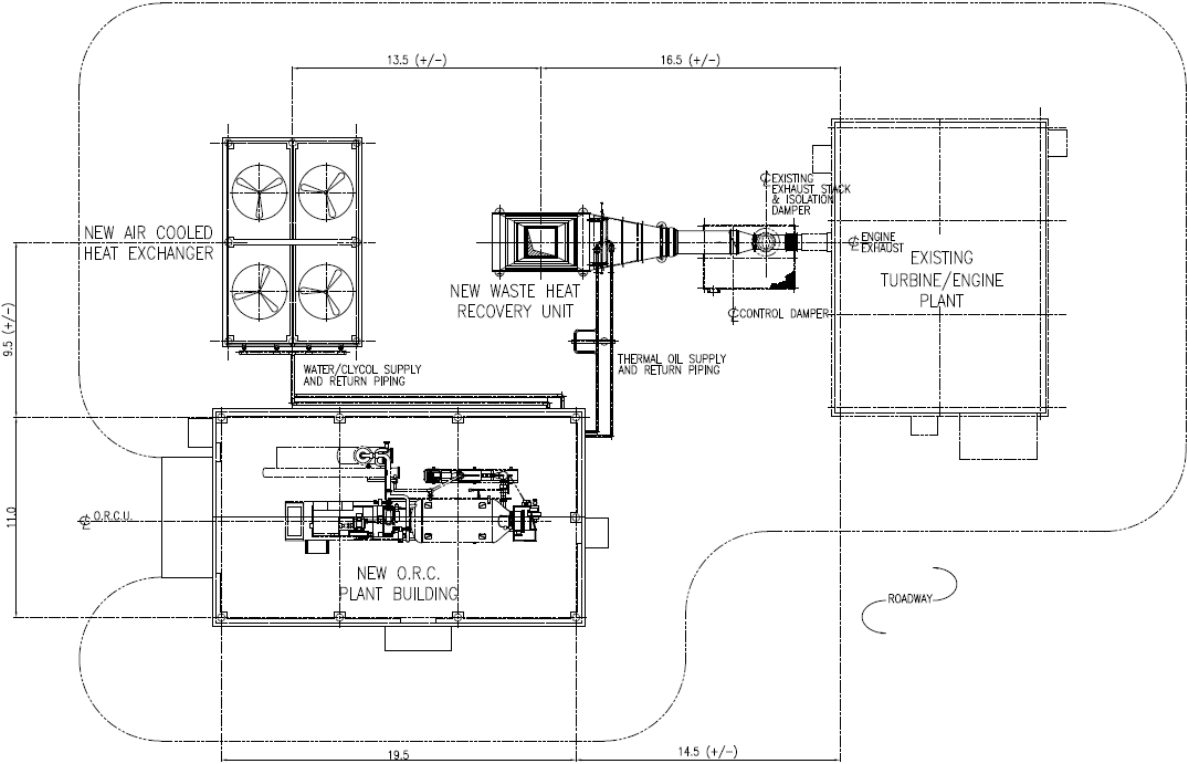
Waste Heat to Power Plant Site Layout (Dimensions in meters)
